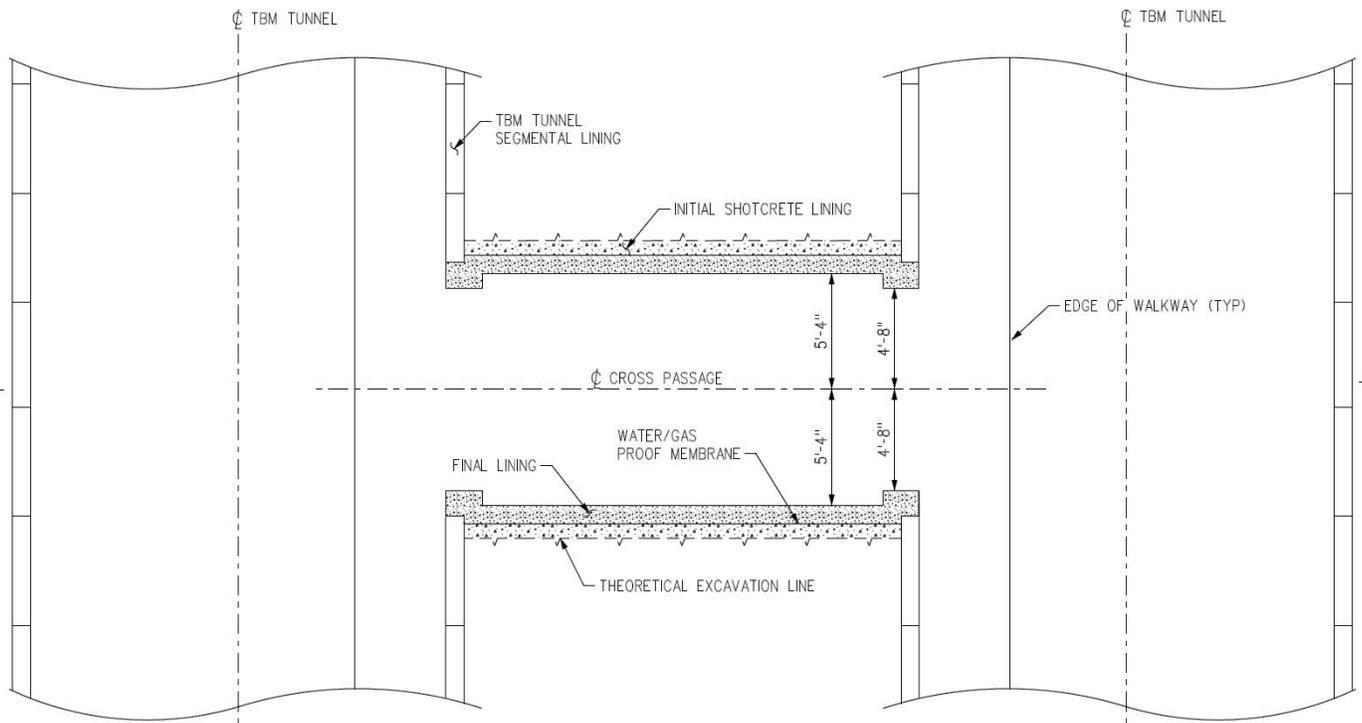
Plan of LRT Tunnels at Location of Cross Passage
